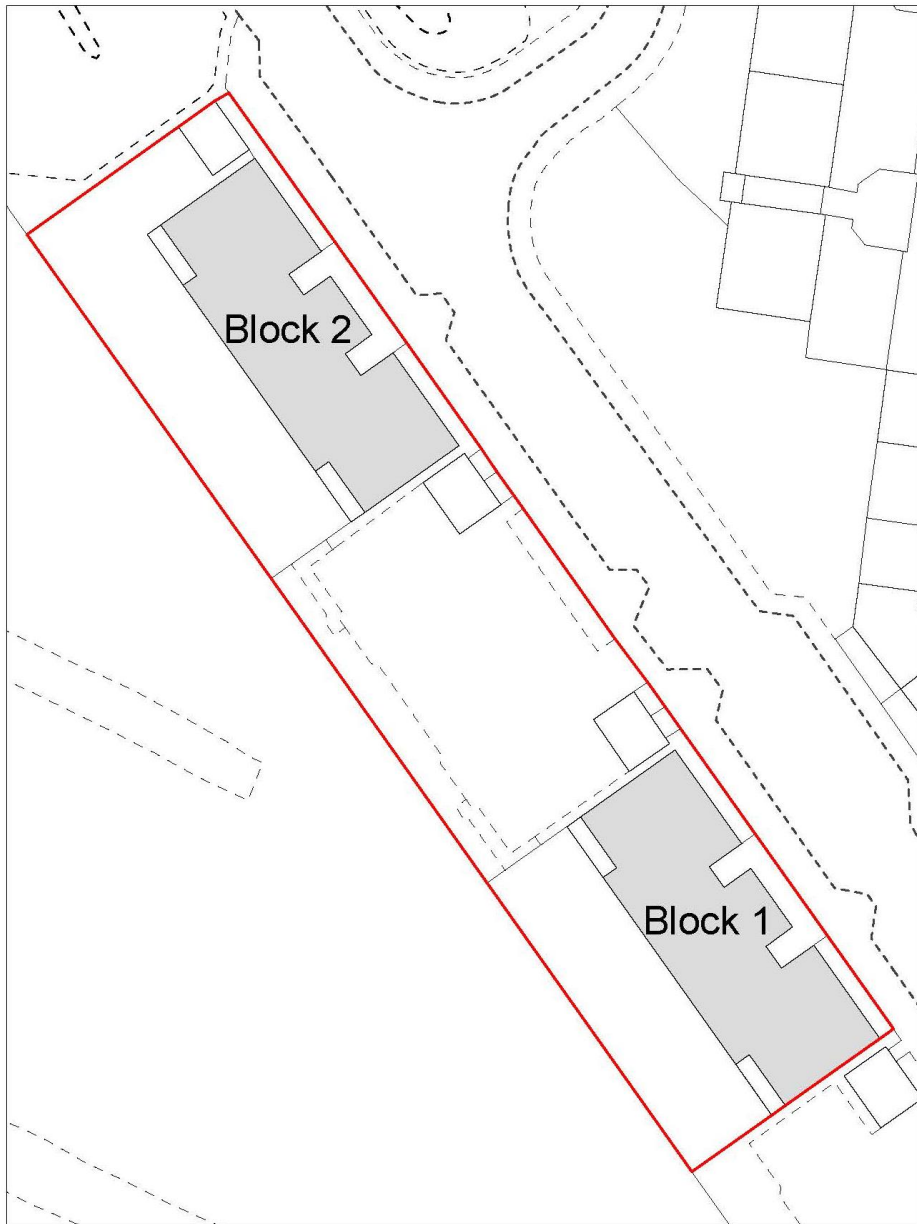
Case B site plan showing Blocks 1 and 2 (scale 1:750)
